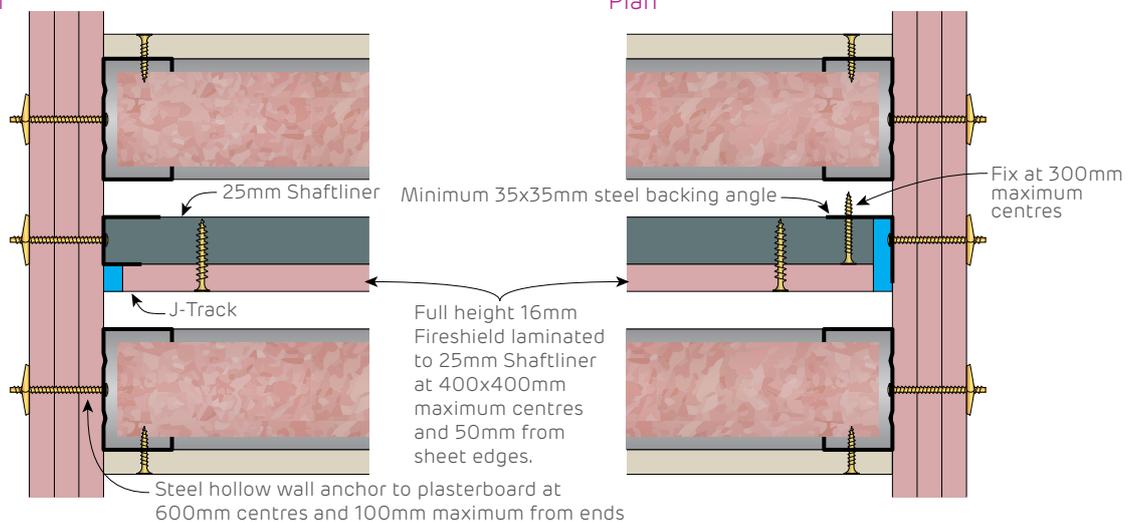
Interhome Highrise Wall to Laminated Vertical Duct
